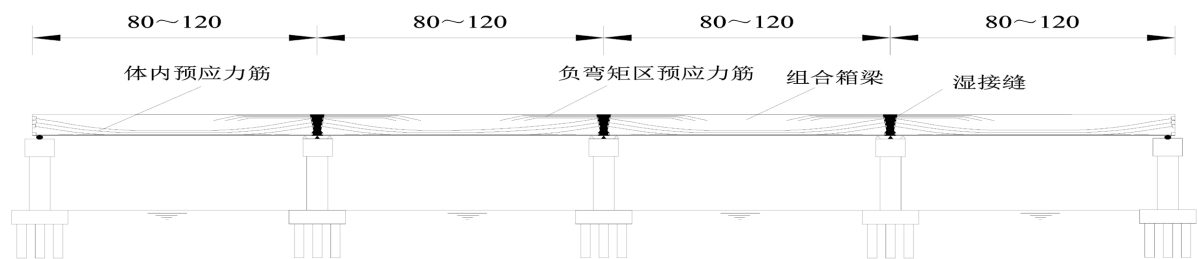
Schematic diagram of a new bridge type for non-navigable spans of the cross-sea bridge
